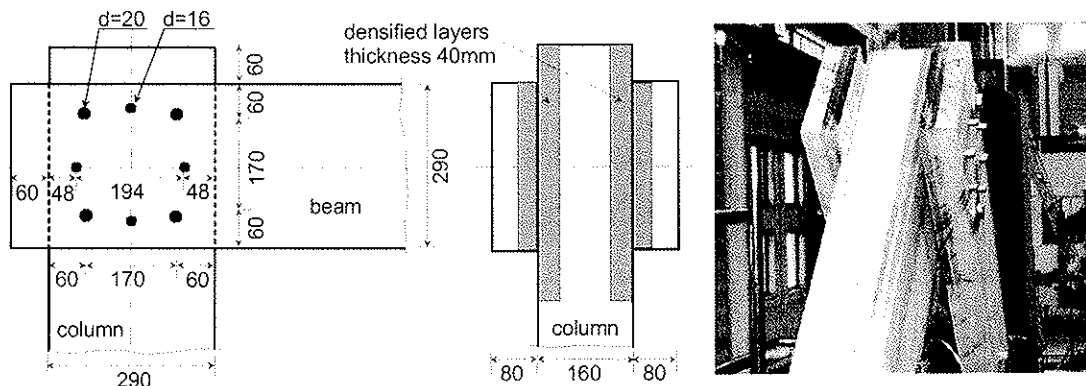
Connection detail and three-dimensional view of a partially densified and reinforced full-size specimen. Only first two laminations (2x20mm) at the interface between the beams and column were densified.
